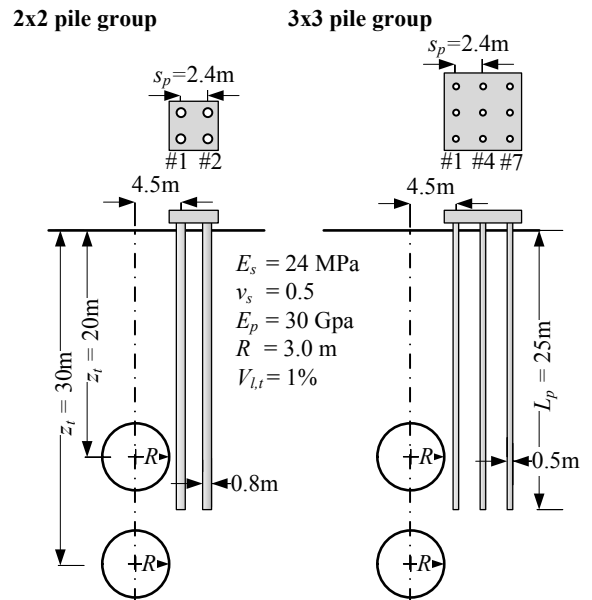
Scenario considered for tunnelling near to capped pile groups.
